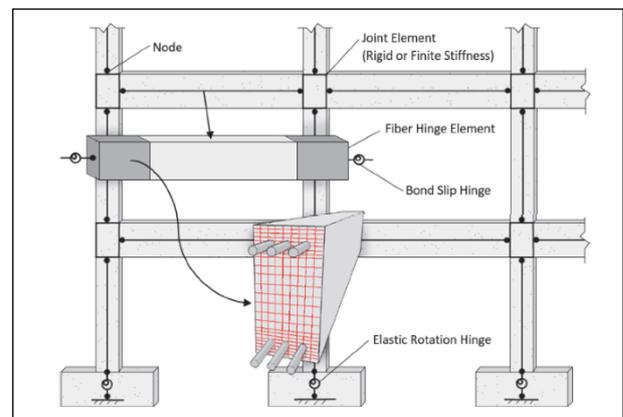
Overview of a typical reinforced-concrete moment-resisting frame system, showing the fiber-type model idealization[11].
